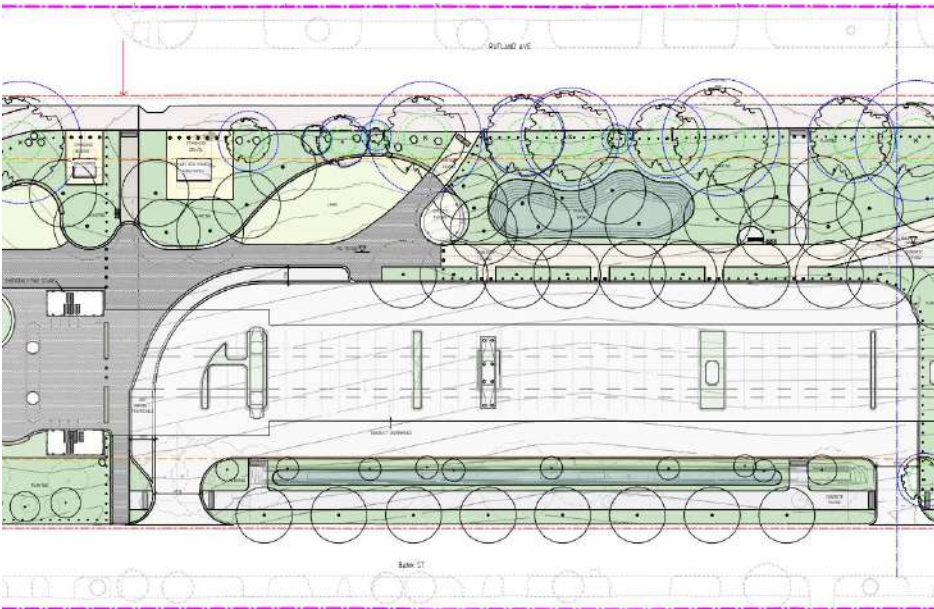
OATS STREET STATION CAR PARKING LOCATION AND LAYOUT 1
